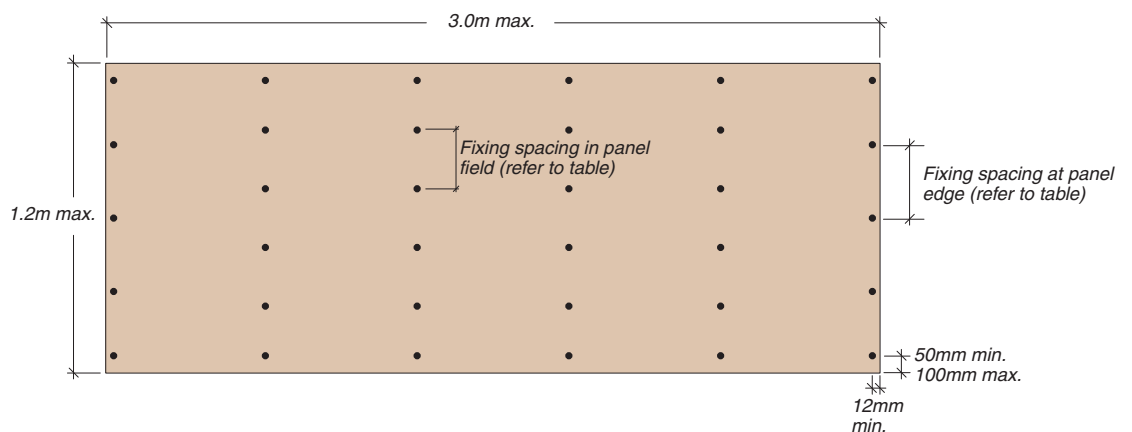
Typical Fixing Detail - Horizontal Fascia Panel
